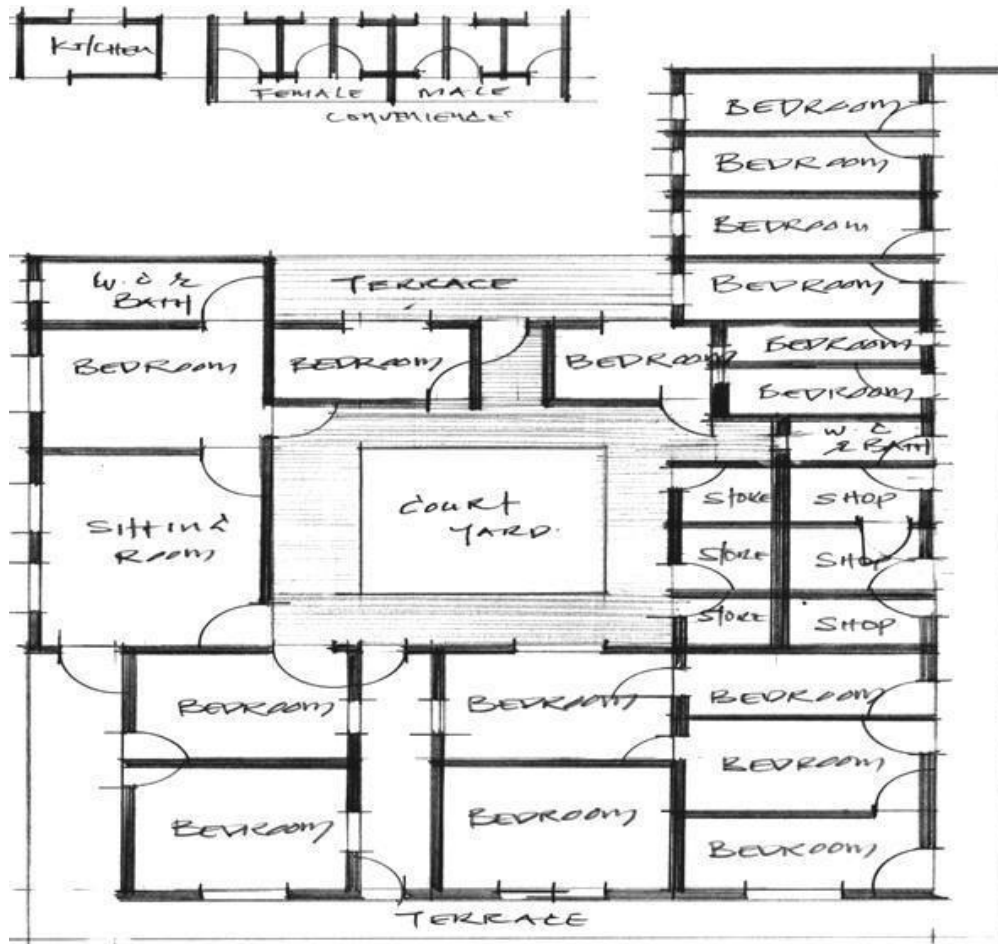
Floor Plan of a Typical Modified Family-Compound Benin House
